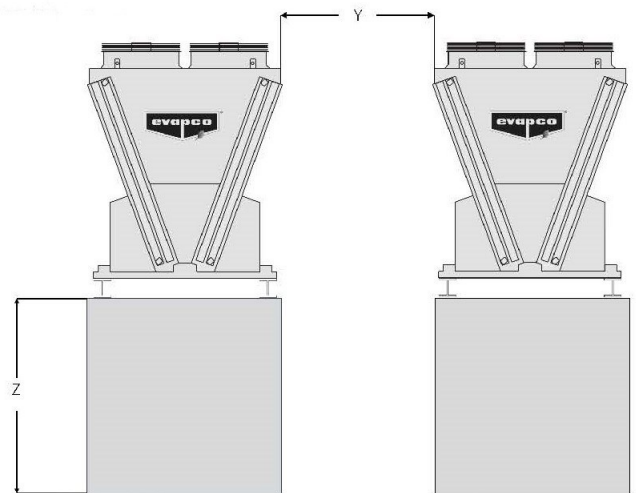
V-Coil & Double Stack Model Elevation and Spacing Positions
